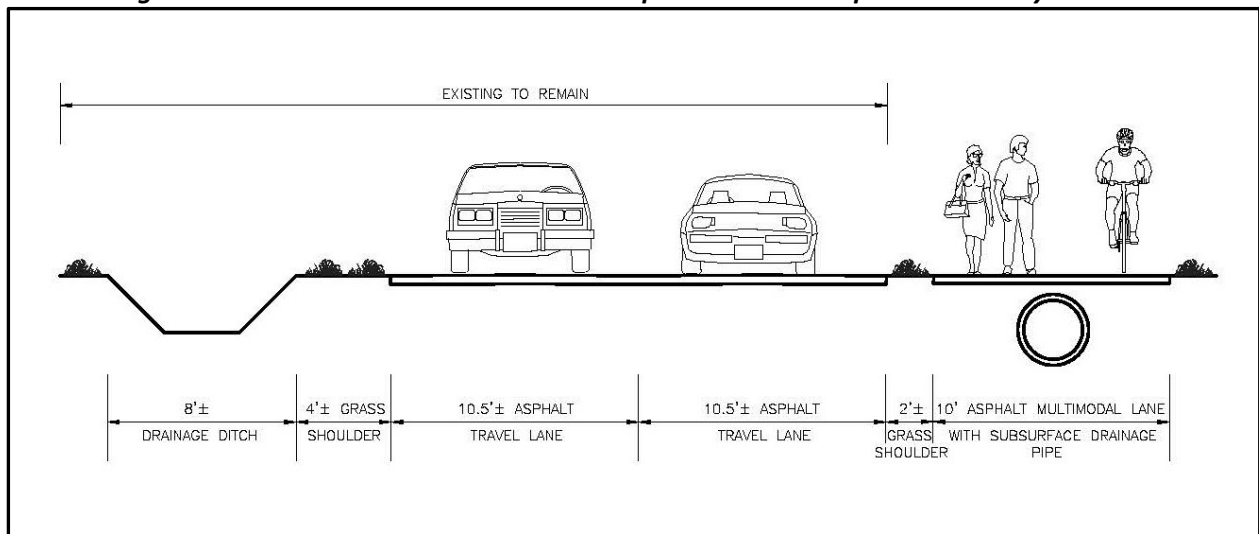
Multimodal Lane Additions - Proposed Roadway Layout
